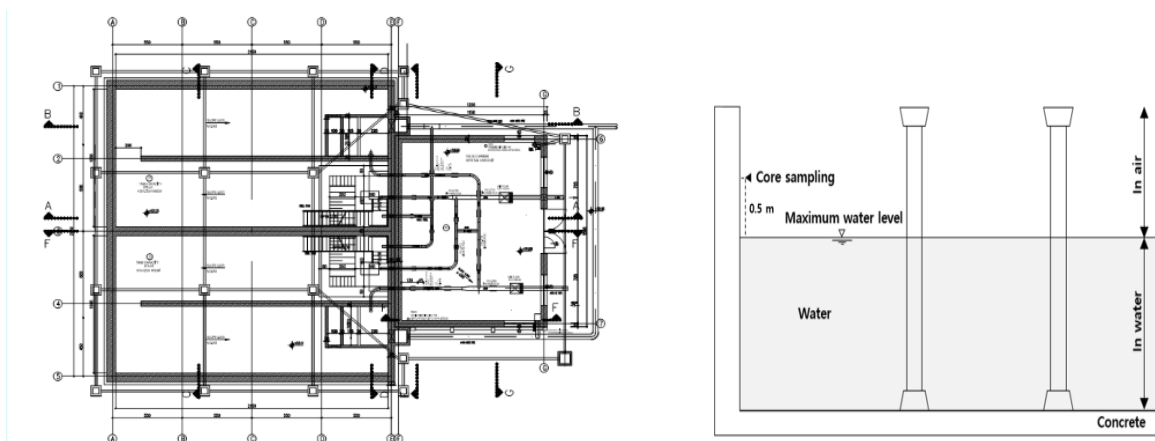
Embedded Water Tank Two Cells Prismatic Reinforced Concrete Type Project
